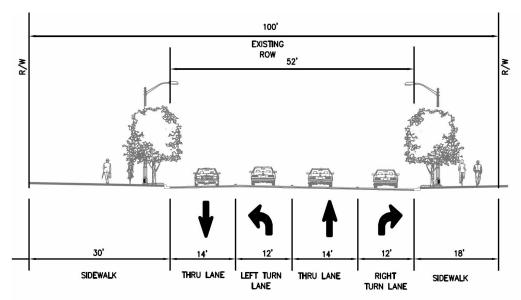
Proposed Cross Section, 3rd Avenue At Signalized Intersections
